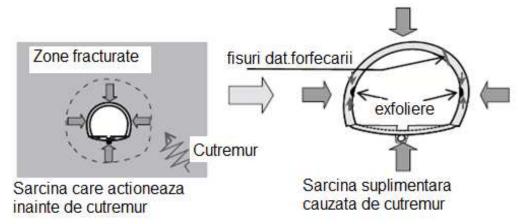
Type 2 - Tunnels built under precarious geological conditions
